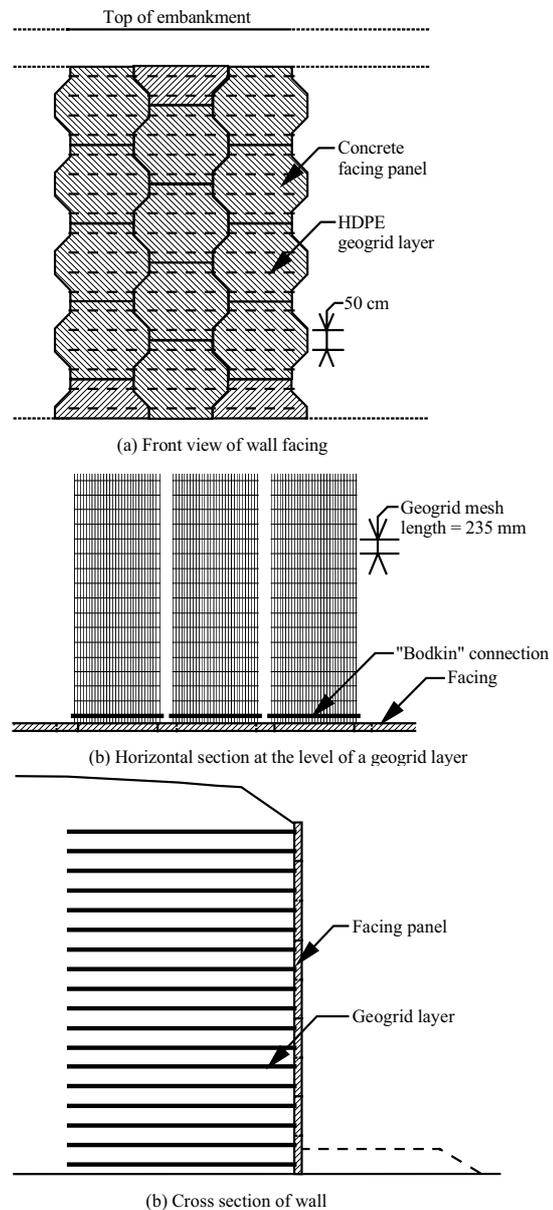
Description of SUMÔ reinforced earth retaining wall.
